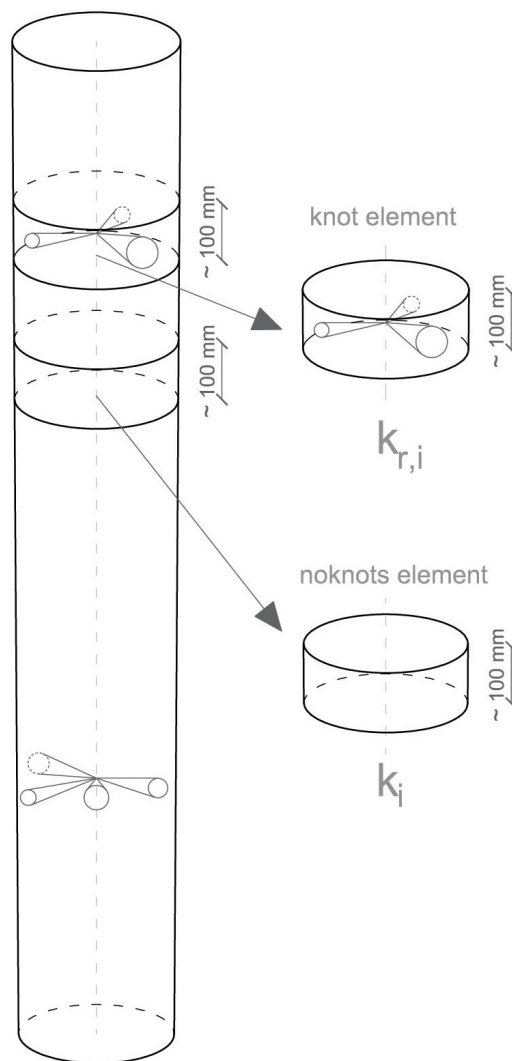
two wooden disks were cut for each of the 3 piles tested. The first one was sawn from a section of piles with knots, the second one was sawn from a section of piles without knots;
